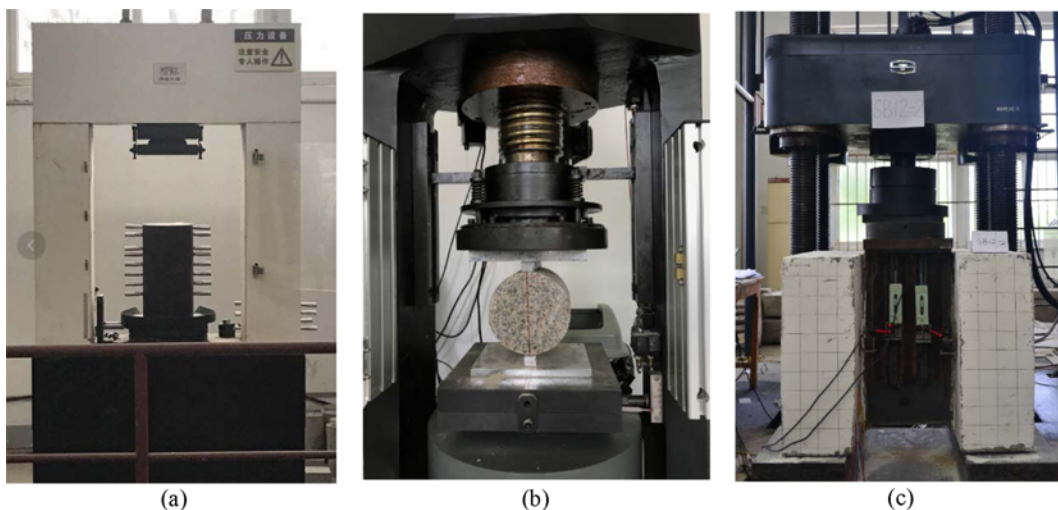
Test Equipment: (a) High Stiffness Rock Press, (b) Electronic Universal Servo Testing Machine, (c) Servo Long Column Tester
